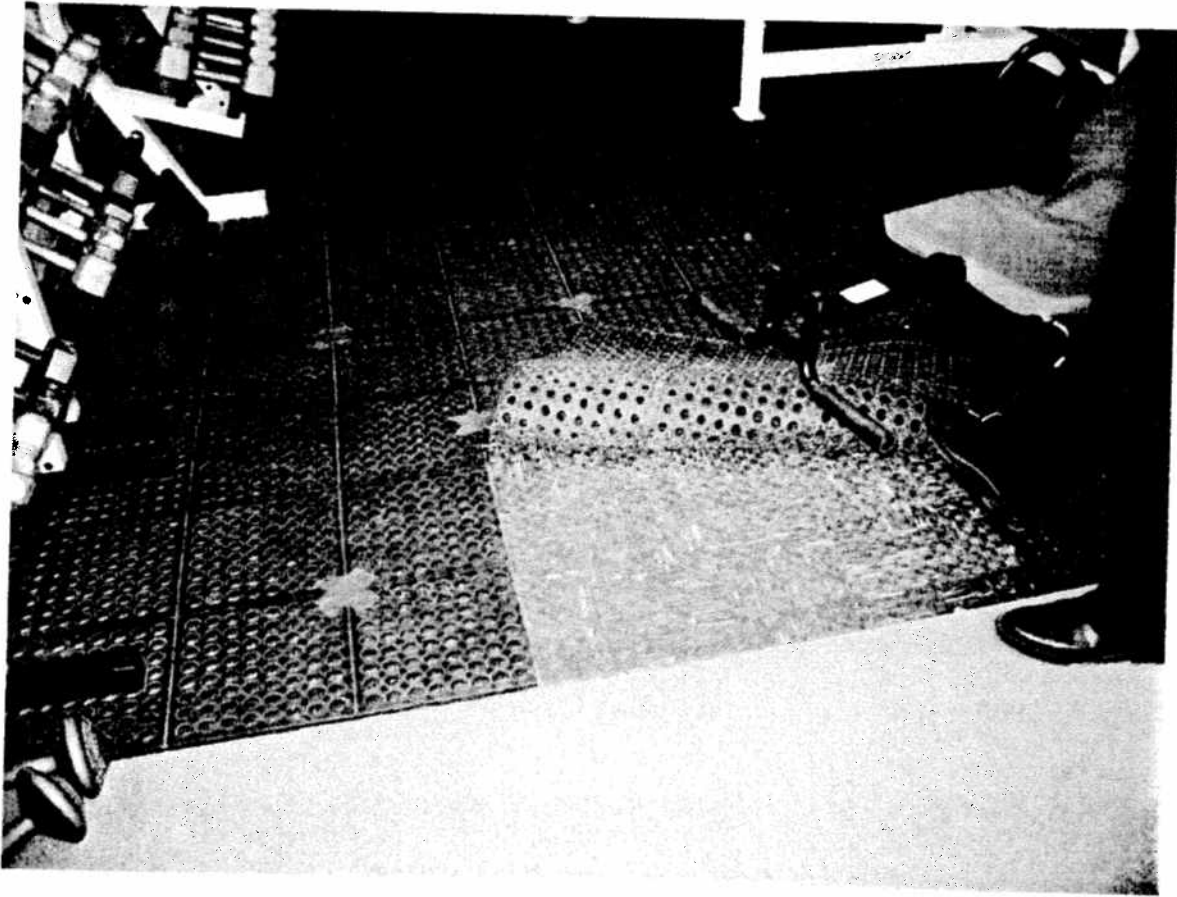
Hominy Armory – fire department workout room floor showing 9”x 9” suspected ACM tile under rubber matting and likely continuing under the newly installed carpet. The tile appears to be in good condition.
